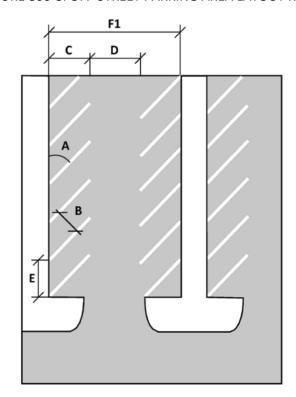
OFF-STREET PARKING AREA LAYOUT REQUIREMENTS
